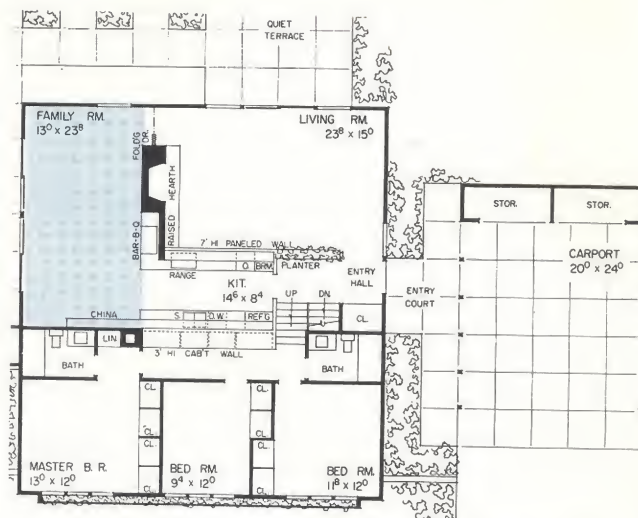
A family room accessible from the kitchen and living room. (Home Planners, Inc.)
